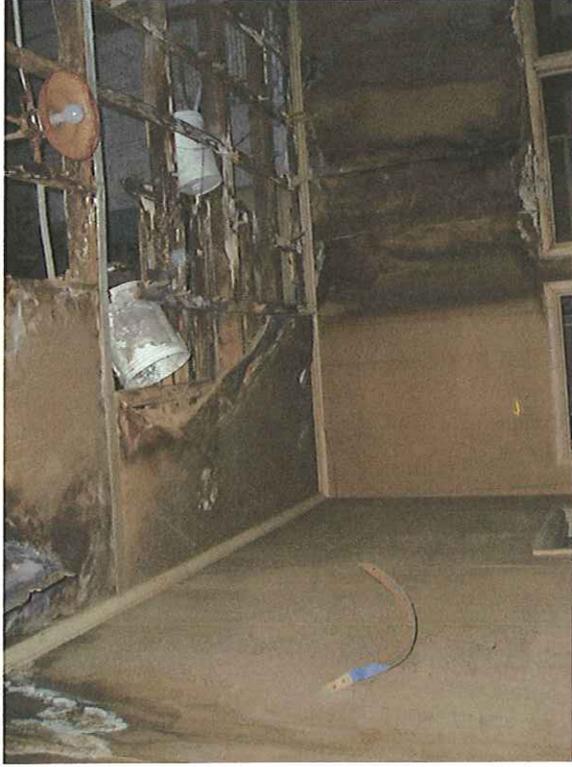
Containers (presumed empty) in rafters above office space, Room 1.
